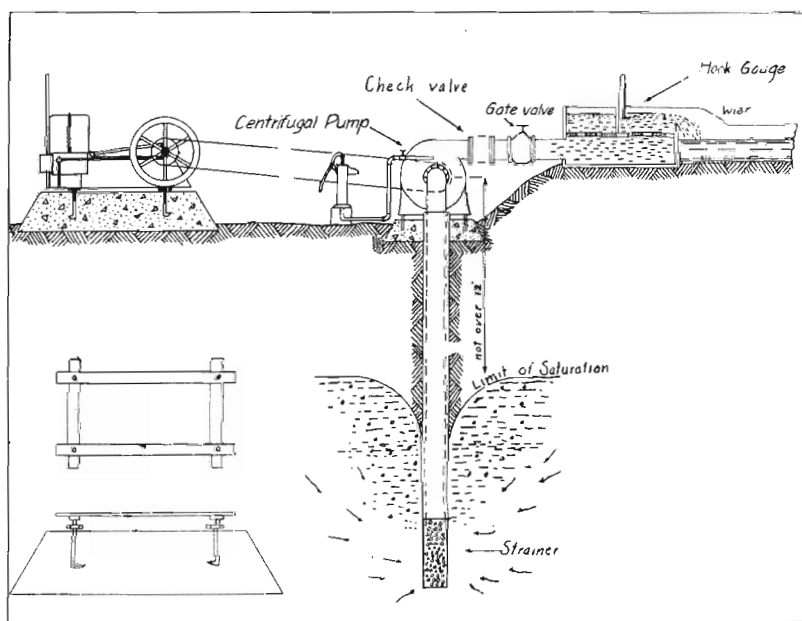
Gasoline Engine and Pumping Plant Design for Well. Templet at lower left corner for spacing bolts in foundation.
